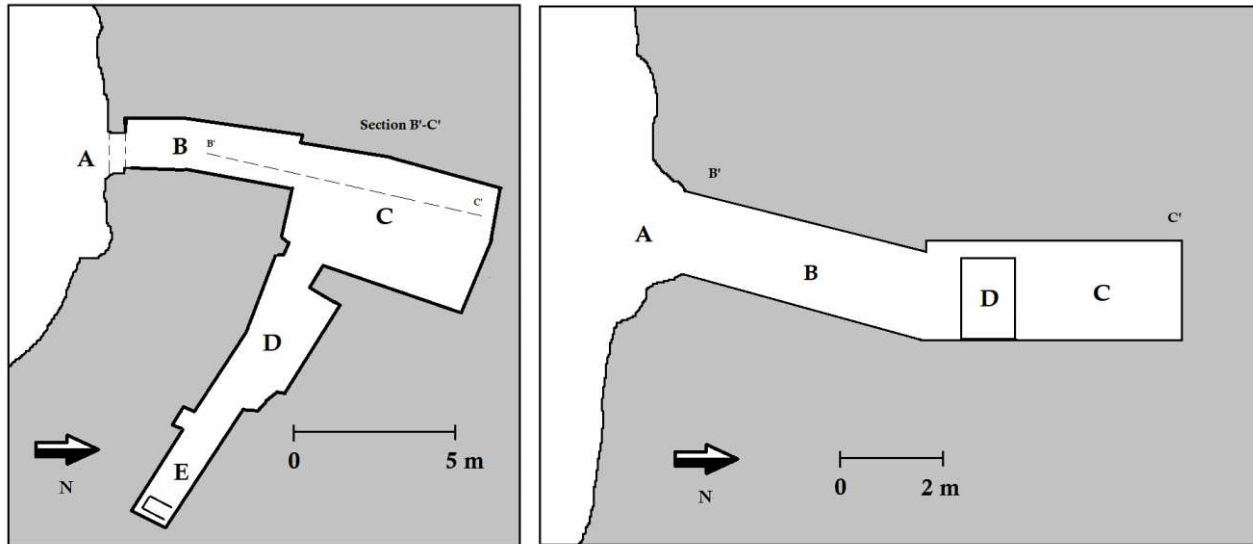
The WC A plan and section in 2019 (drawing author)
